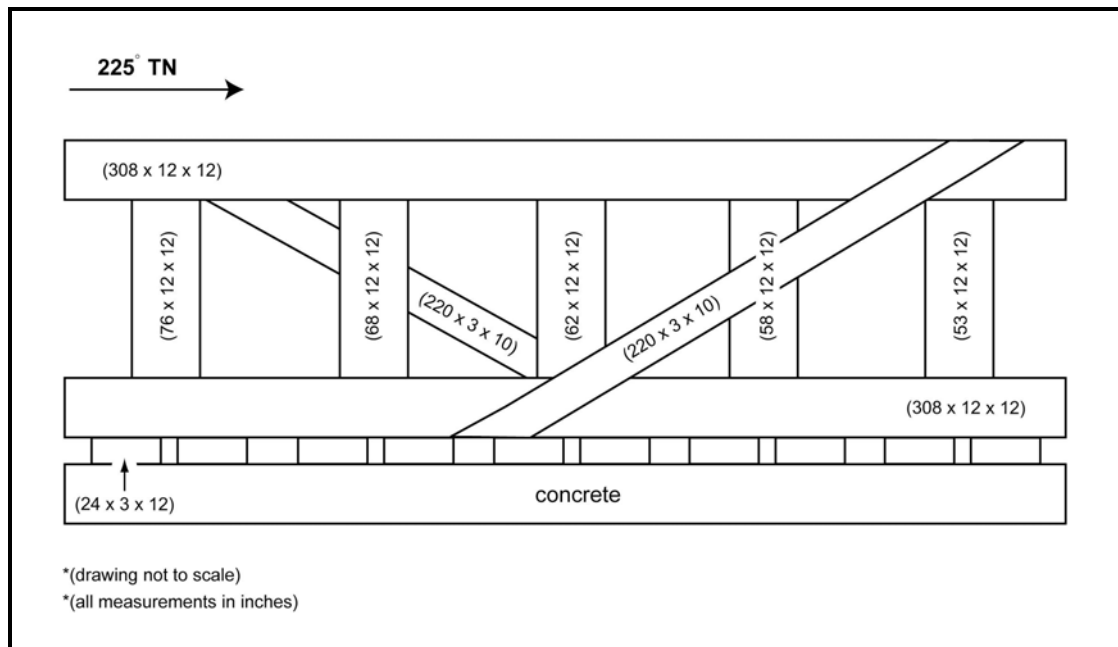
Schematic profile of SHIP # 50-80-07-6823, showing wooden column and bent supports, with wooden diagonal bracing, and the visible portion (concrete) of the bridge's pier
